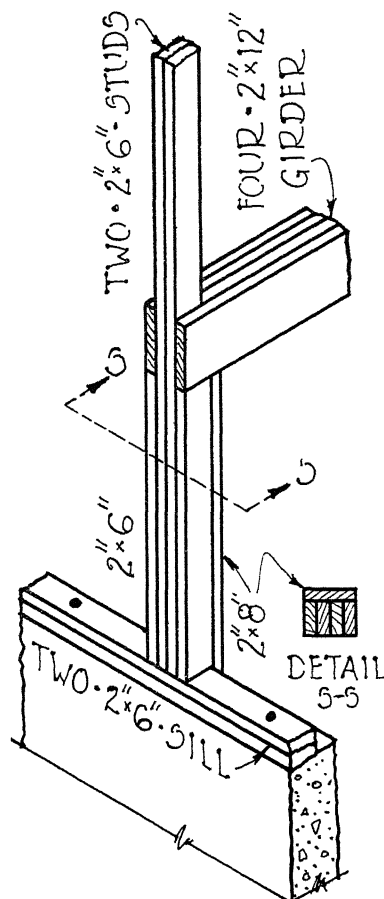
View showing construction at end of girders (also see Figs. 11 and 13). This illustration also shows details of sill and studding connections
